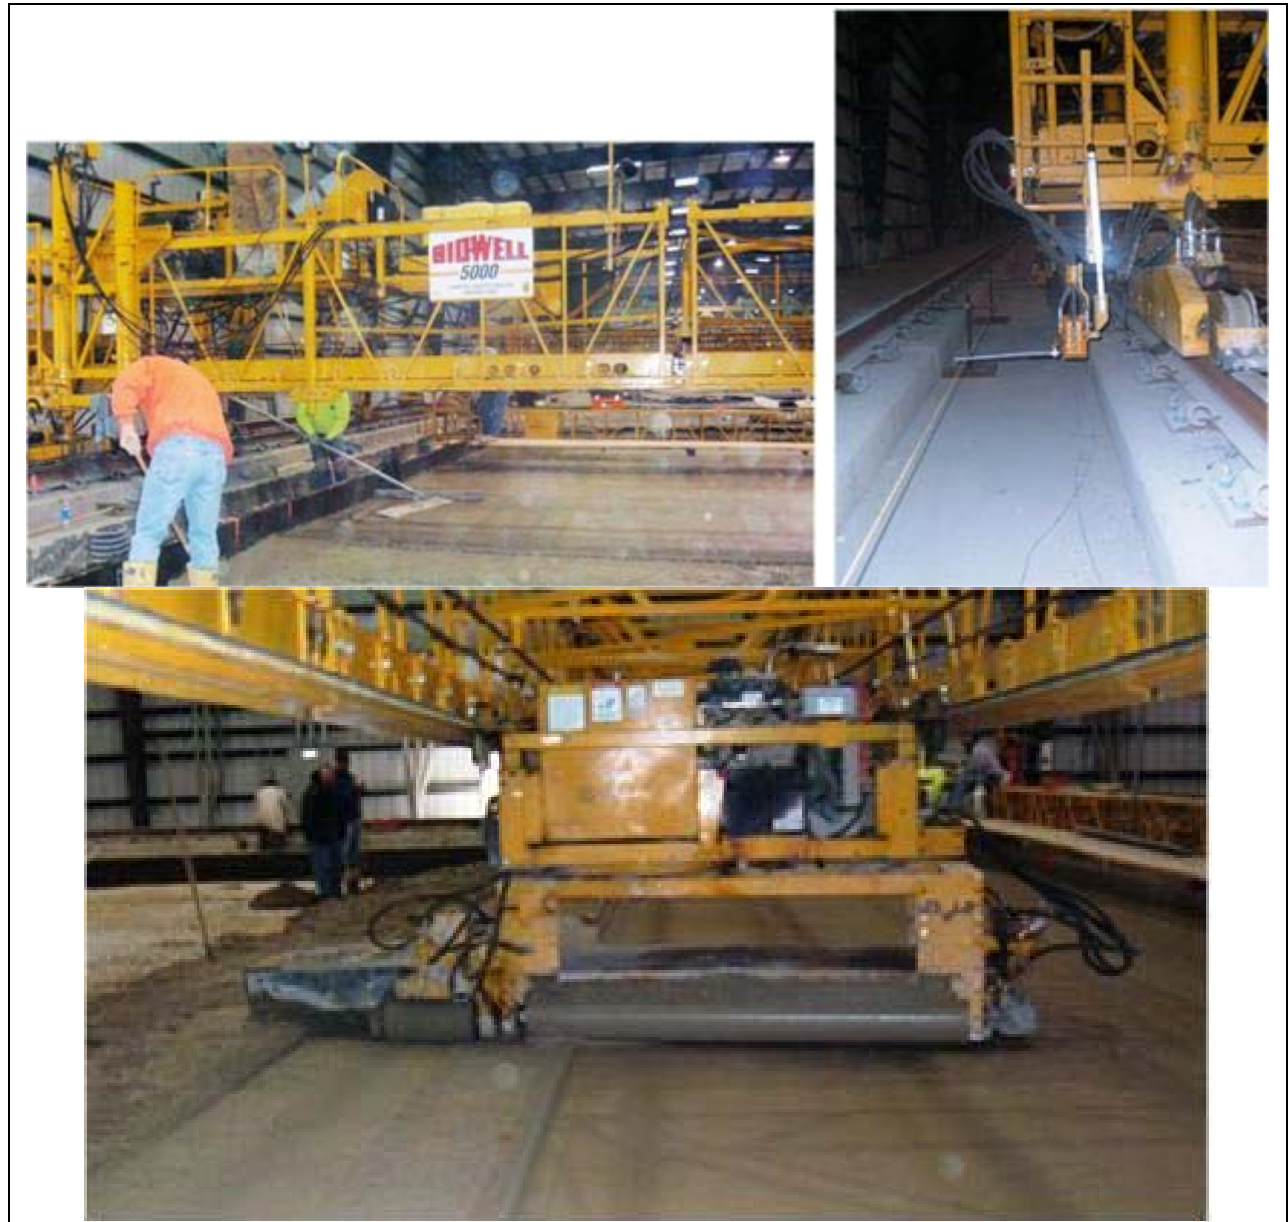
BIDWELL 5000 FORM RIDING CONCRETE PAVING MACHINE
